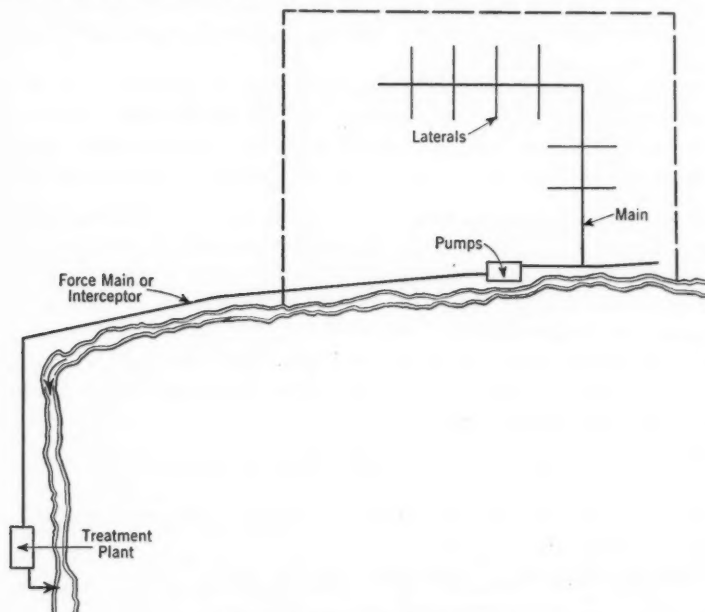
TYPICAL SEWERAGE SYSTEM
